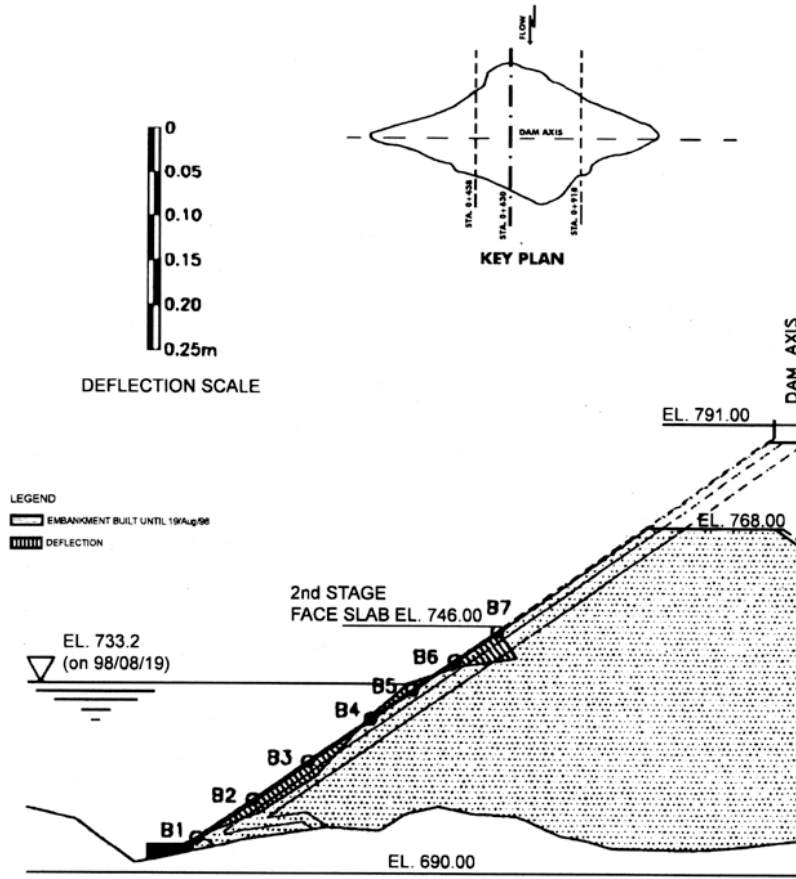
Tianshengqiao dam. Deflection of 2nd stage slab on section B.
